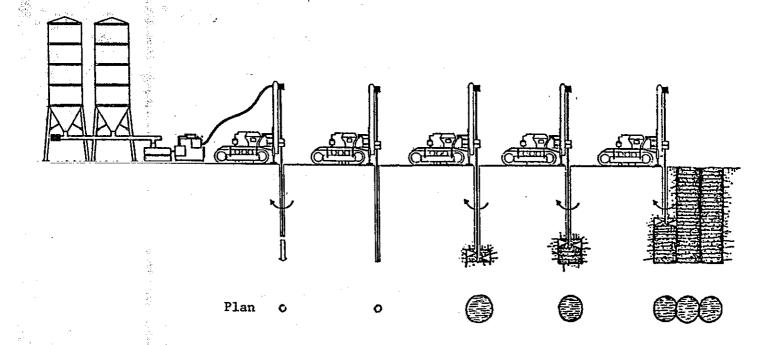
JET GROUTING: FORMATION OF STABILIZED SOIL COLUMNS
